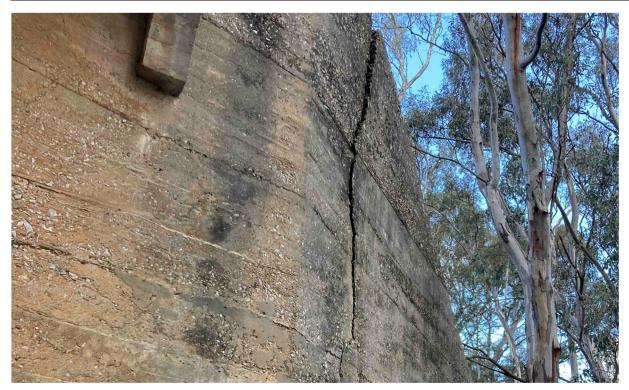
Burfords Hill Road bridge, south-west wingwall showing significant cracking
